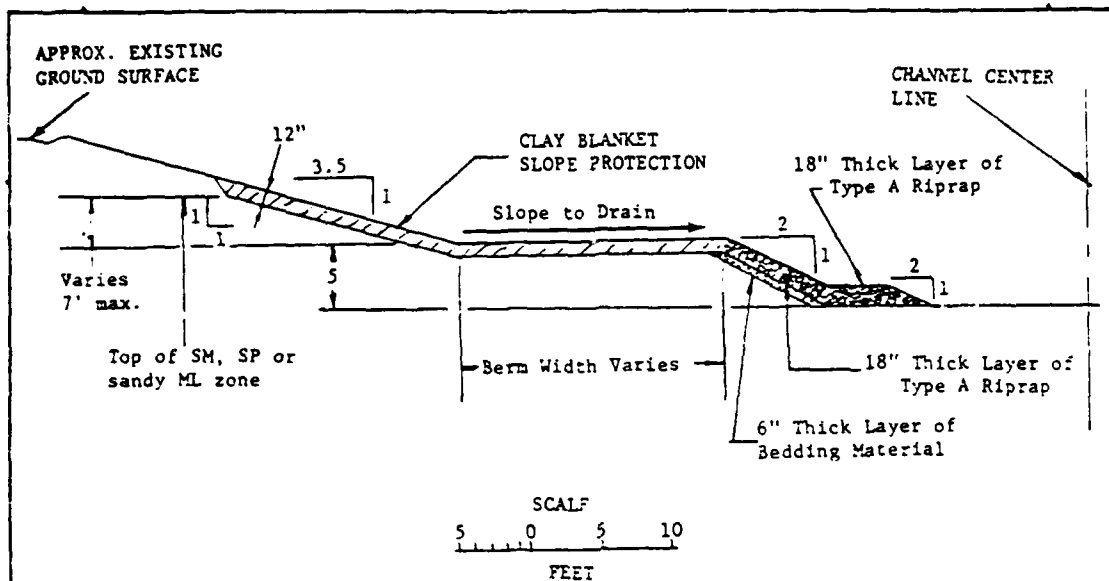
Little Blue River at Independence, Mo. Typical section of clay blanket side-slope and berm protection.
